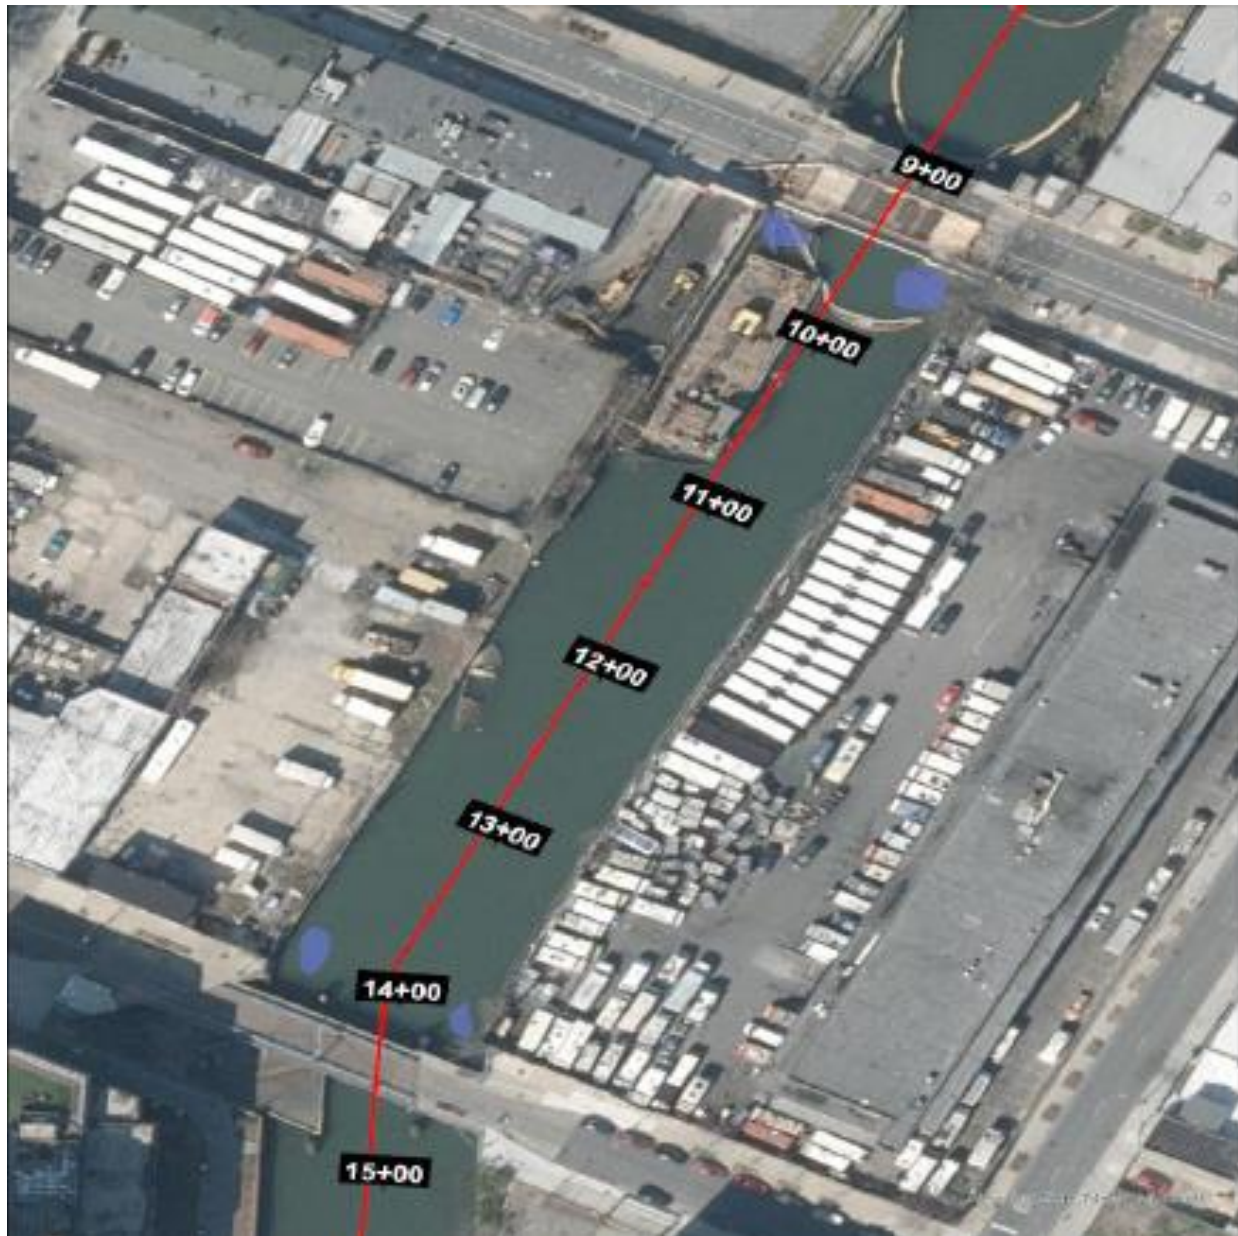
RTA-1 activities continued north of the Union Street bridge on 05/09/2022 with dredging conducted for the Monopile barge from stations 9+56 to 9+60, 9+48 to 9+75 and 13+97 to 14+05: the east and west corners of the southside Union Street Bridge and east and west corners of the northside of Carroll Street Bridge. No Debris was identified. No Weeks was shipped to Clean Earth.
